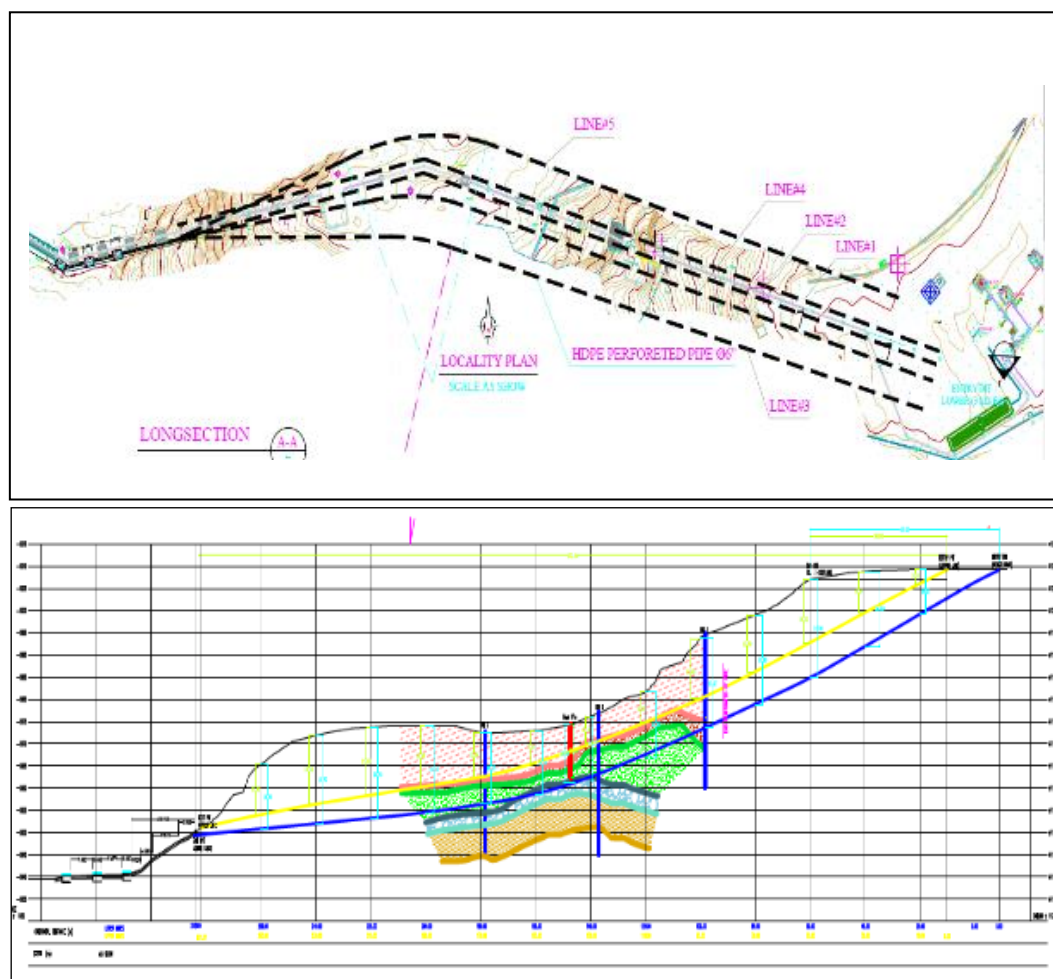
Five (5) line of Awi-14 brine line pipe horizontal deep drain layout and cross section
